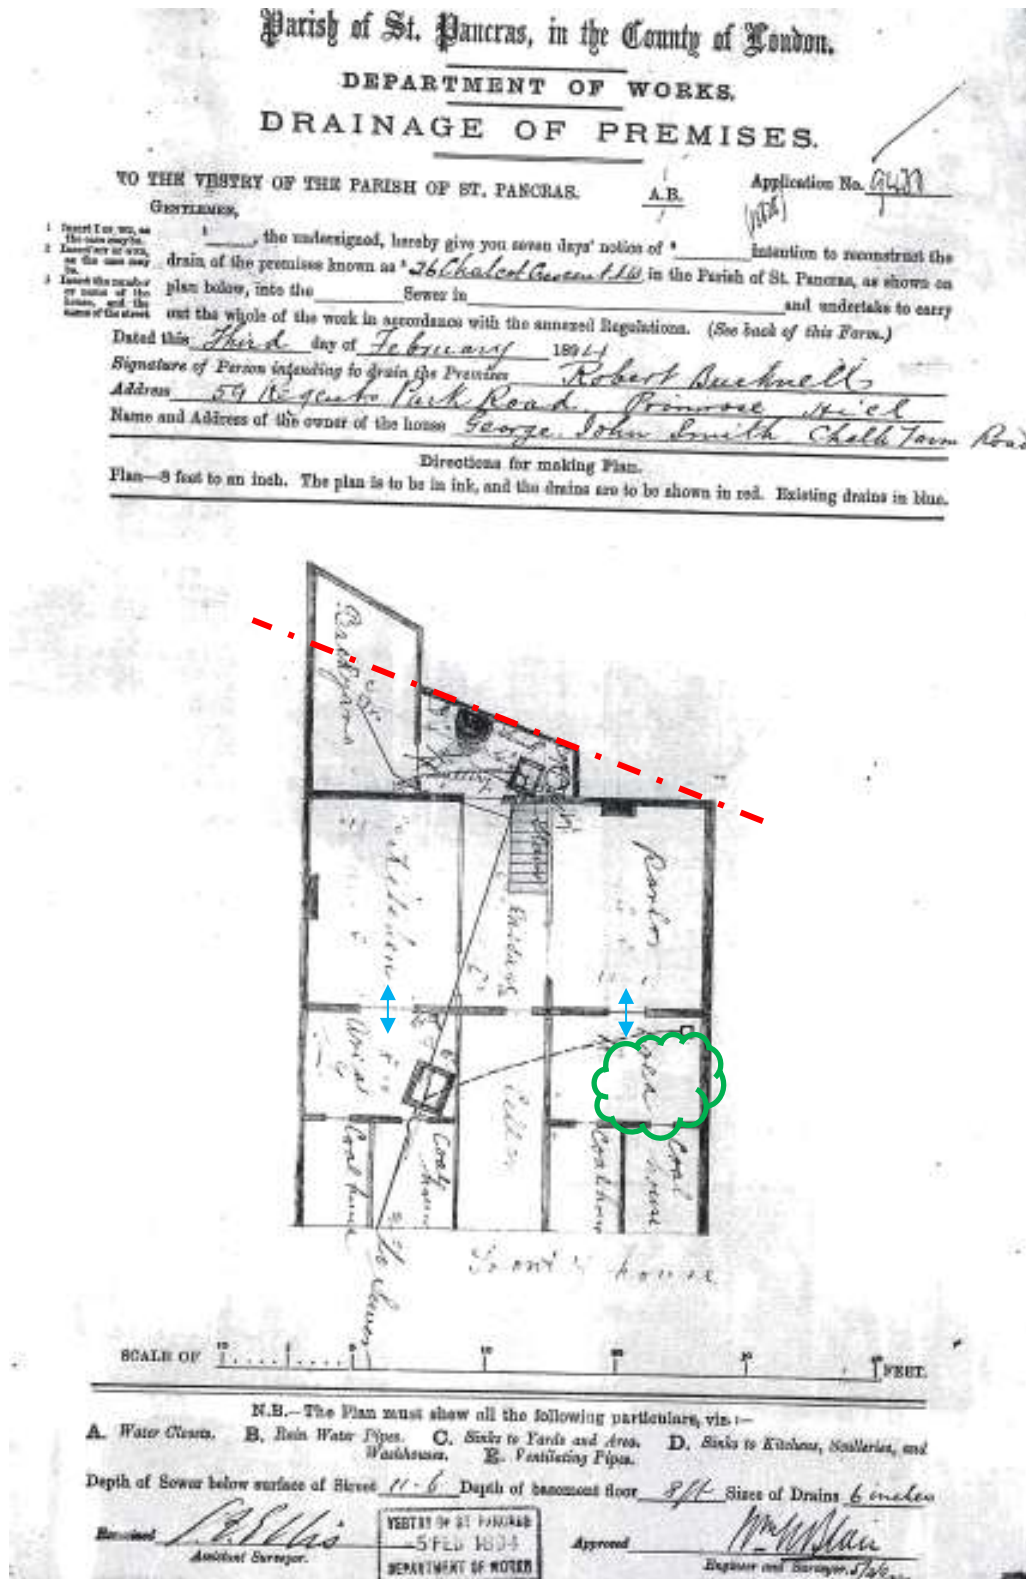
Basement Drainage Plan of No. 26 Chalcot Crescent. Dated 3rd of February 1894. The rear yard shown has since been truncated (see red dash). The doors at basement level of the principal façade to the front lightwells from Kitchen and Parlour are shown with blue arrows. Note at this point there was no external staircase shown within the southern (green cloud) lightwell, although an internal basement stair was present. Source: Camden Archive Centre (accessed 21st August 2018).
